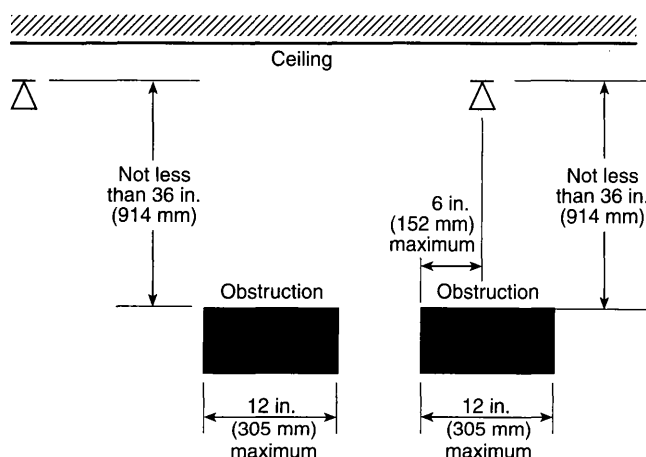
Obstruction More Than 36 in. (914 mm) Below the Sprinkler (Large Drop Sprinkler).
